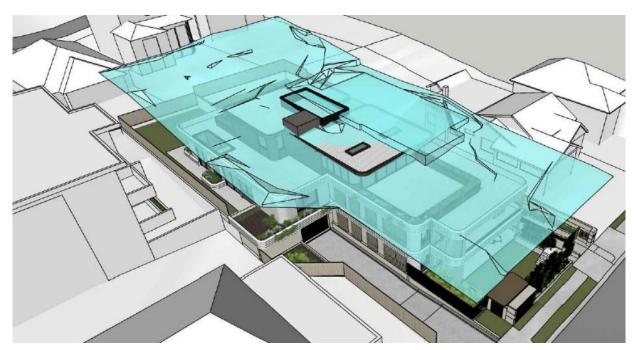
Plan extract showing the developments compliance with the 8 metre height of building standard measured to the underside of the uppermost ceiling
